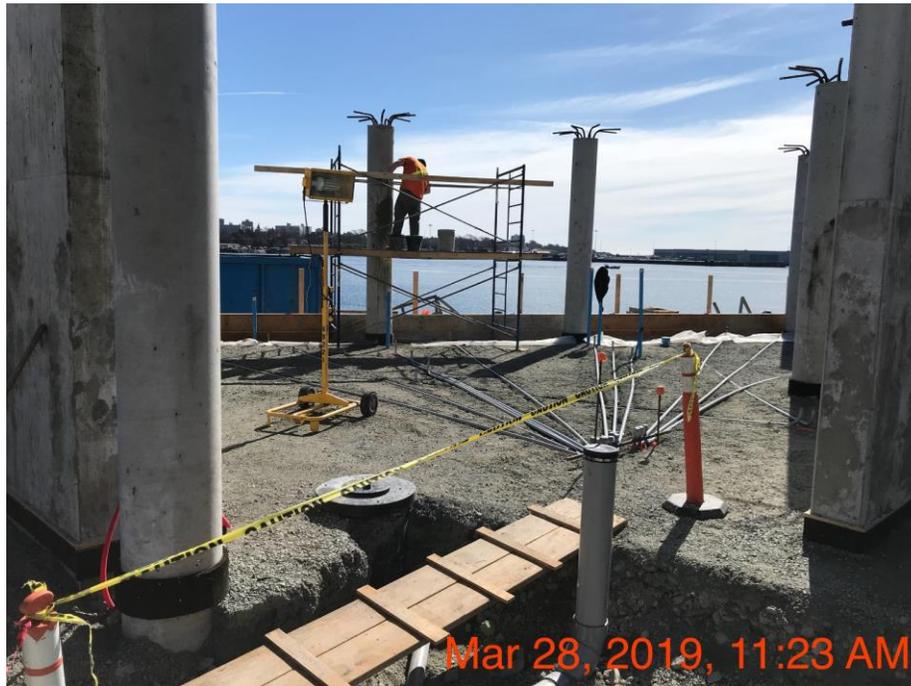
McLoughlin Point Wastewater Treatment Plant: installation of electrical conduit in Lab area.
